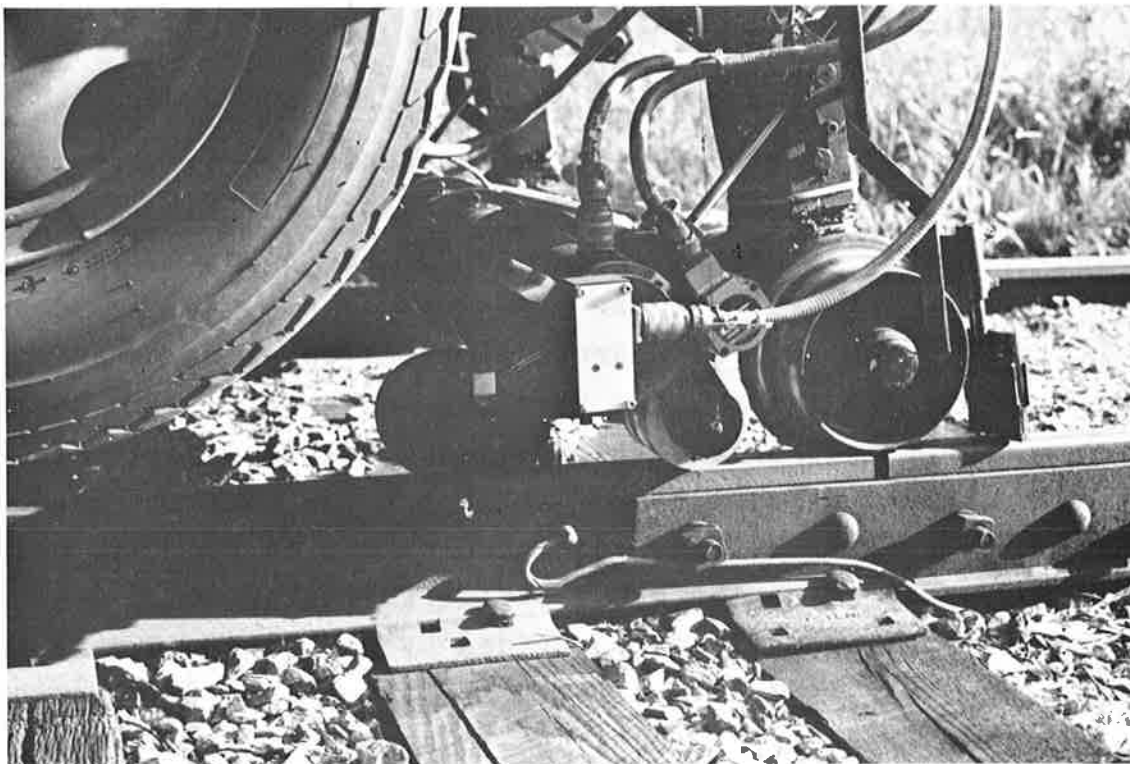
TRACK GEOMETRY MEASUREMENT BEAM WITH GAGE SENSORS DEPLOYED
